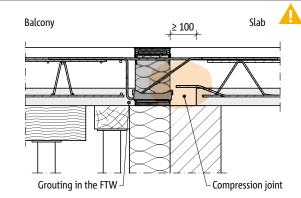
Schöck Isokorb® XT type K: Fully finished balcony with height offset floor on precast reinforced concrete wall
